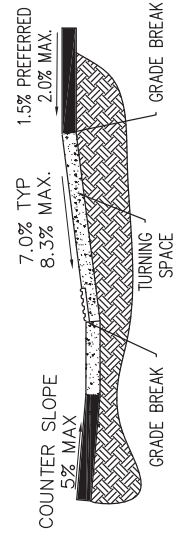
DETAIL D - PERPENDICULAR CURB RAMPS WITH SHARED TURNING SPACE
